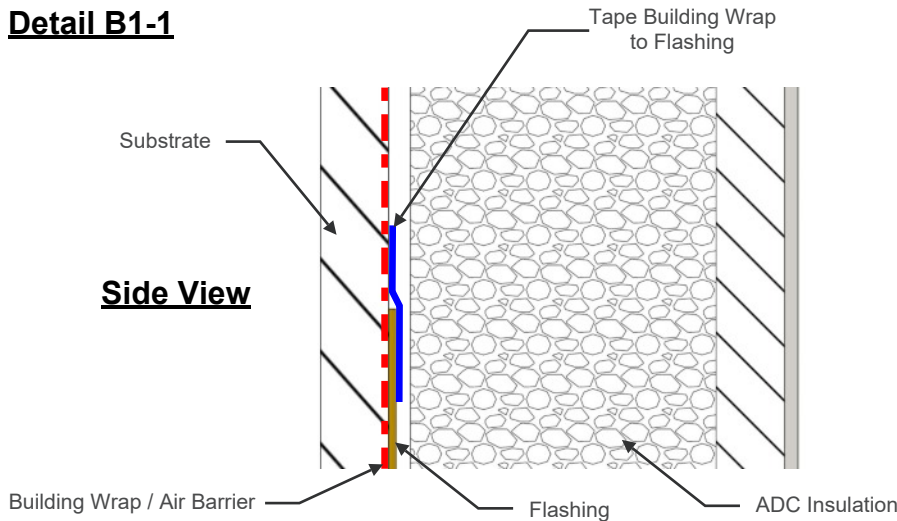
Flanged Window Header Side View Cut-Away N.T.S.
